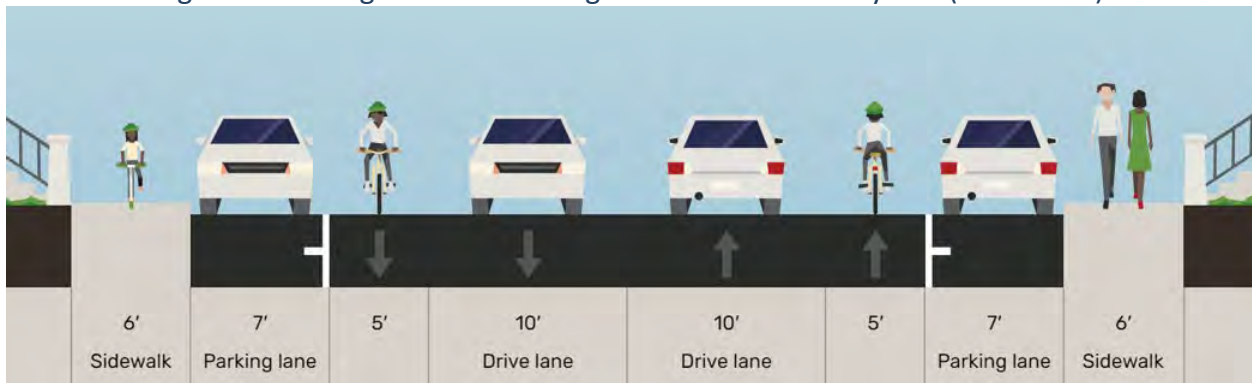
Existing Section – Monterey Ave to Park Ave (38-ft ROW)
